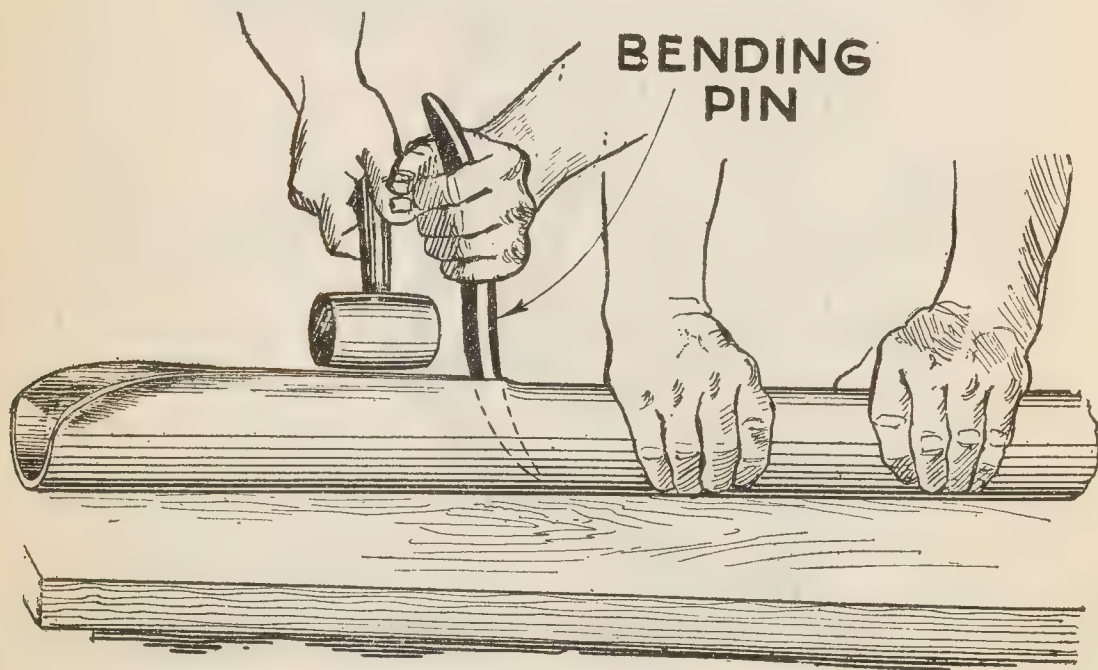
,531.—*Bending by cutting and beating, 2.* Raising end of V with bending pin.
